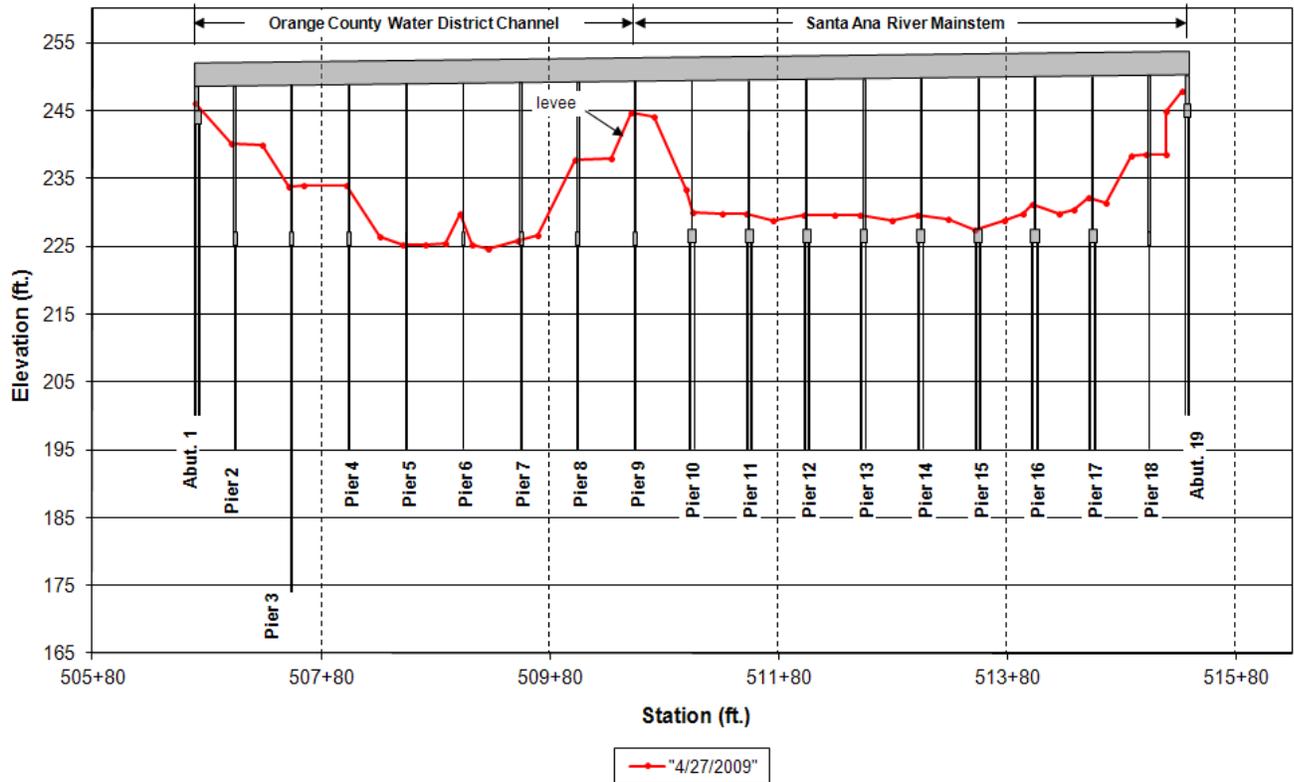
Channel Layout under the Santa Ana River Bridge (Br. No. 55-0106).
